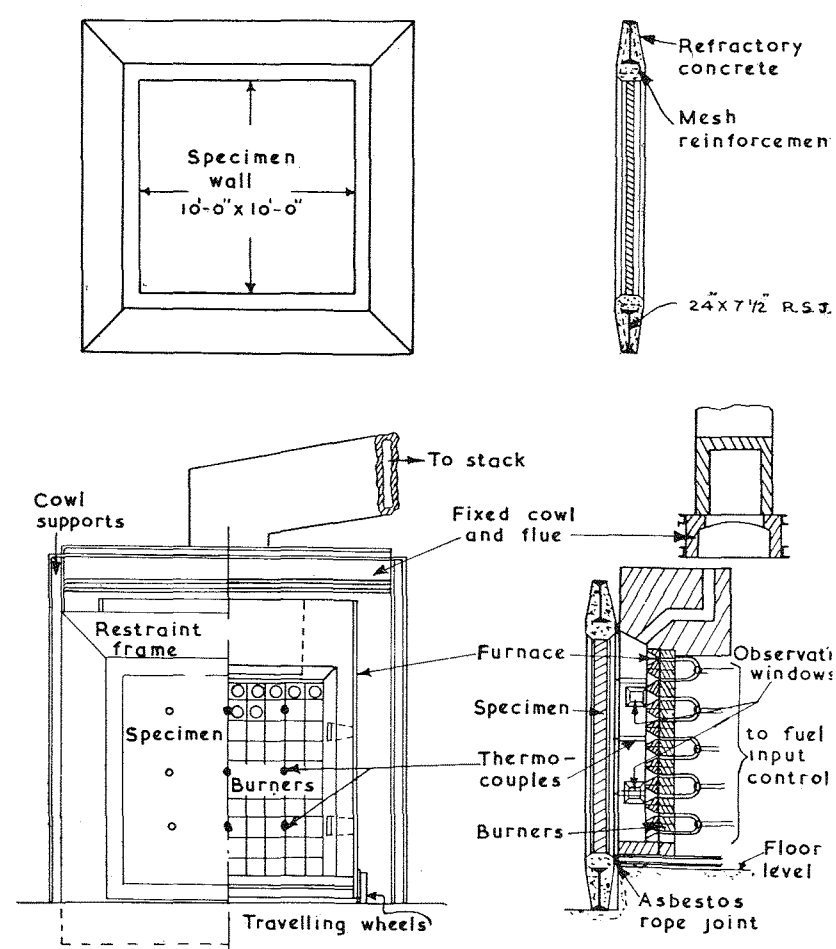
Furnace testing equipment, showing details of end restraint (above), a half sectional elevation (lower left), and a part sectional side elevation of the furnace closed with the non-loadbearing wall in position ready for test.
